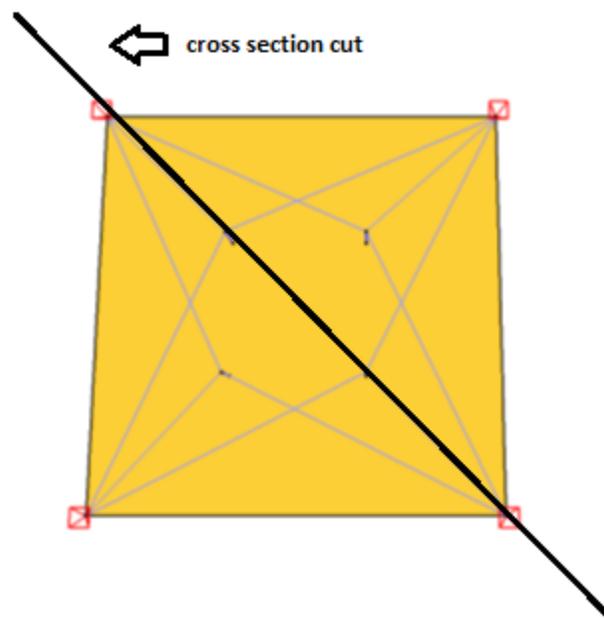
View from below of the four strut cable truss with the cross section cut for Figure 8
